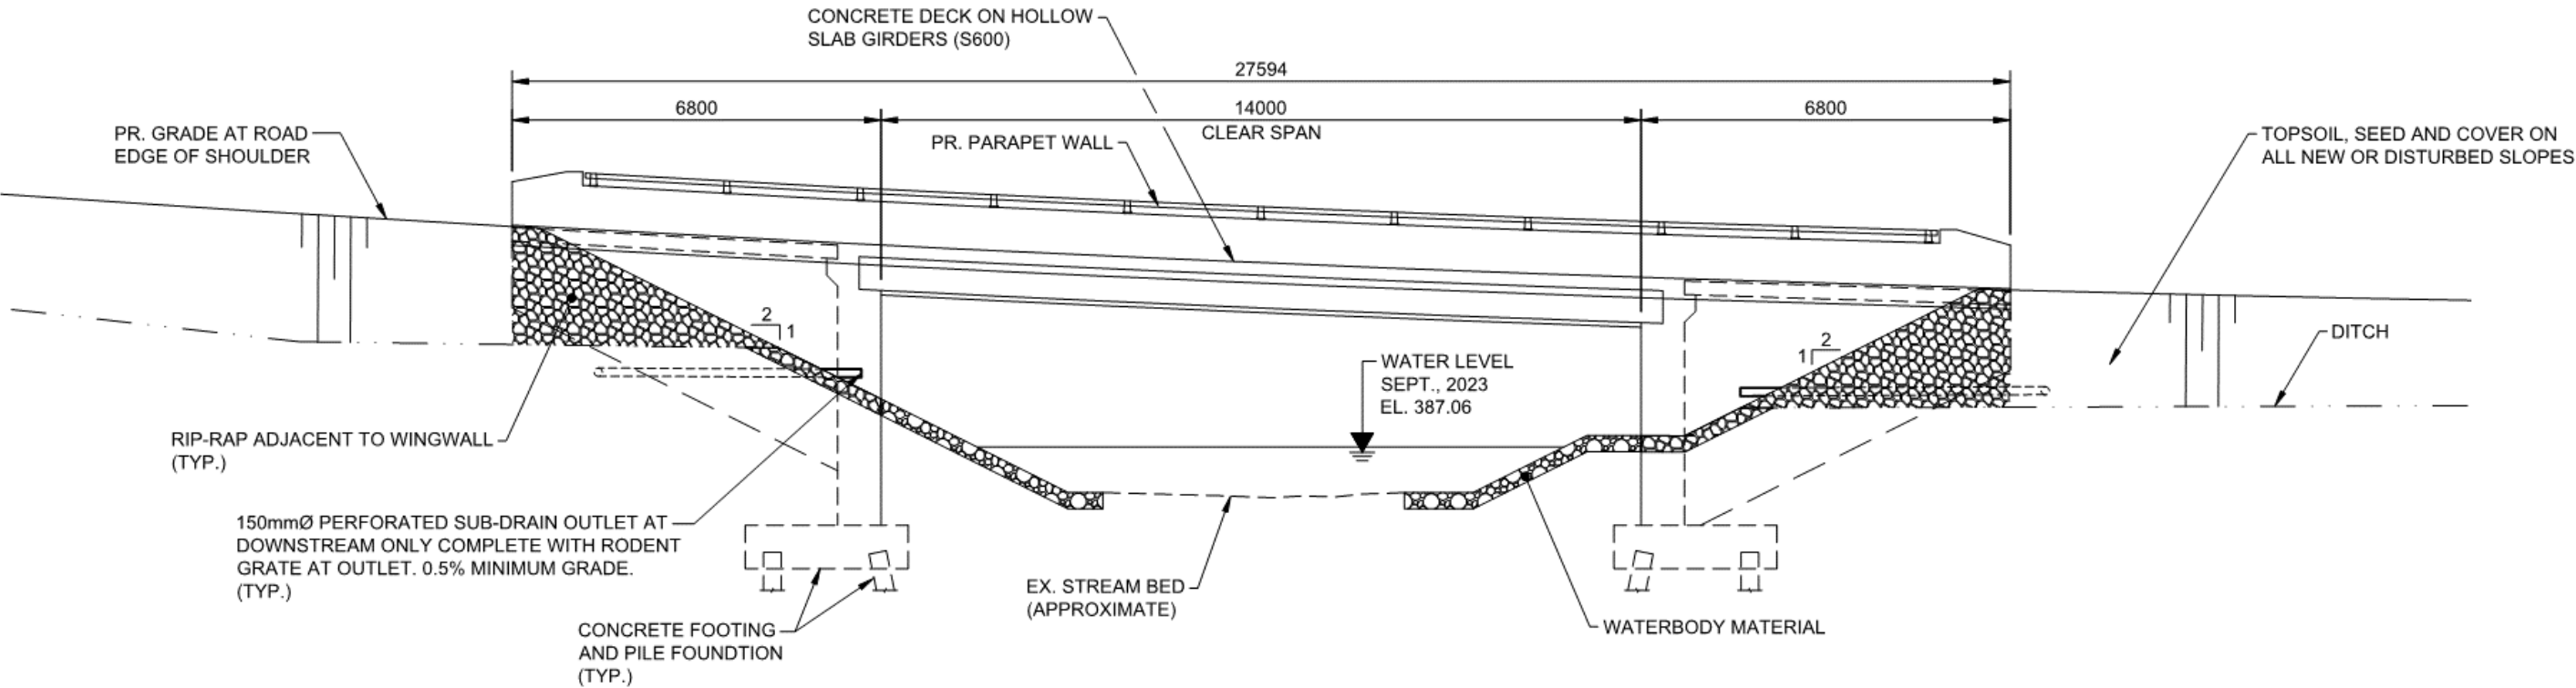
Cross-Section View of Conceptual Design, Bridge 28-P
